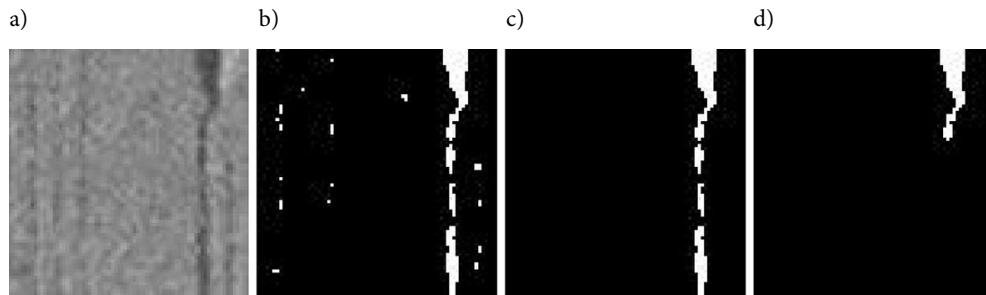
Example of noncontinuous pavement crack: a – raw crack block; b – local filtering; c – minor removal; d – maximum extraction
